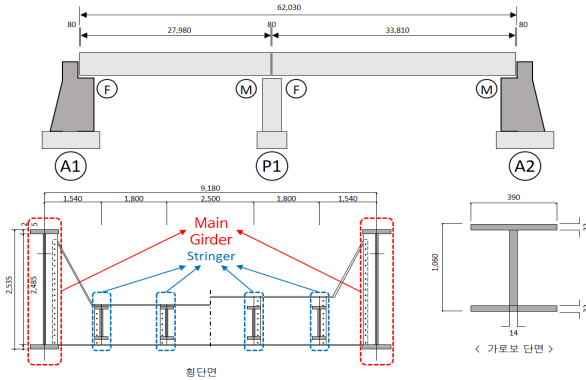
Geometry and dimensions of bridge and spring element in modeling
